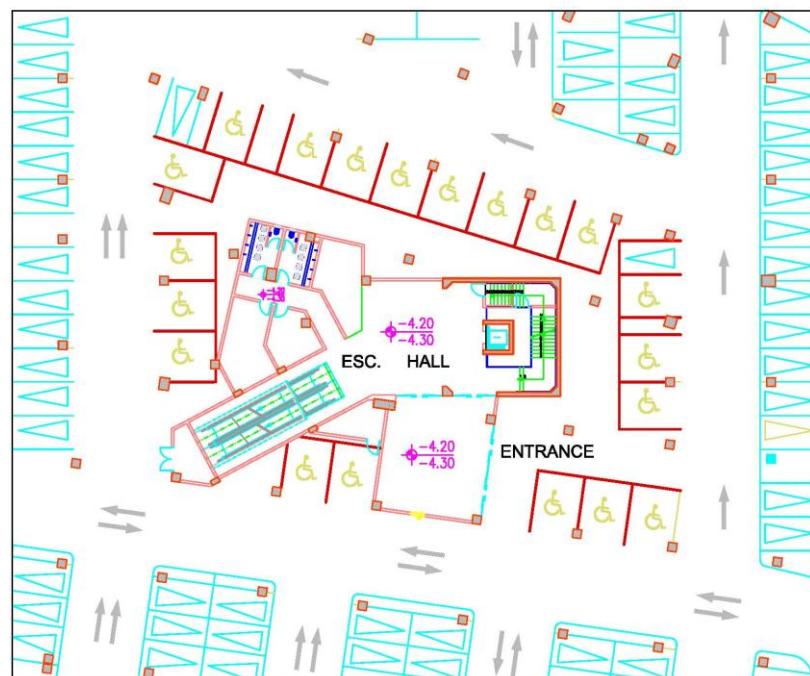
Partial plan of the entrance at the closed parking space at basement level 1 in Forum Ankara
